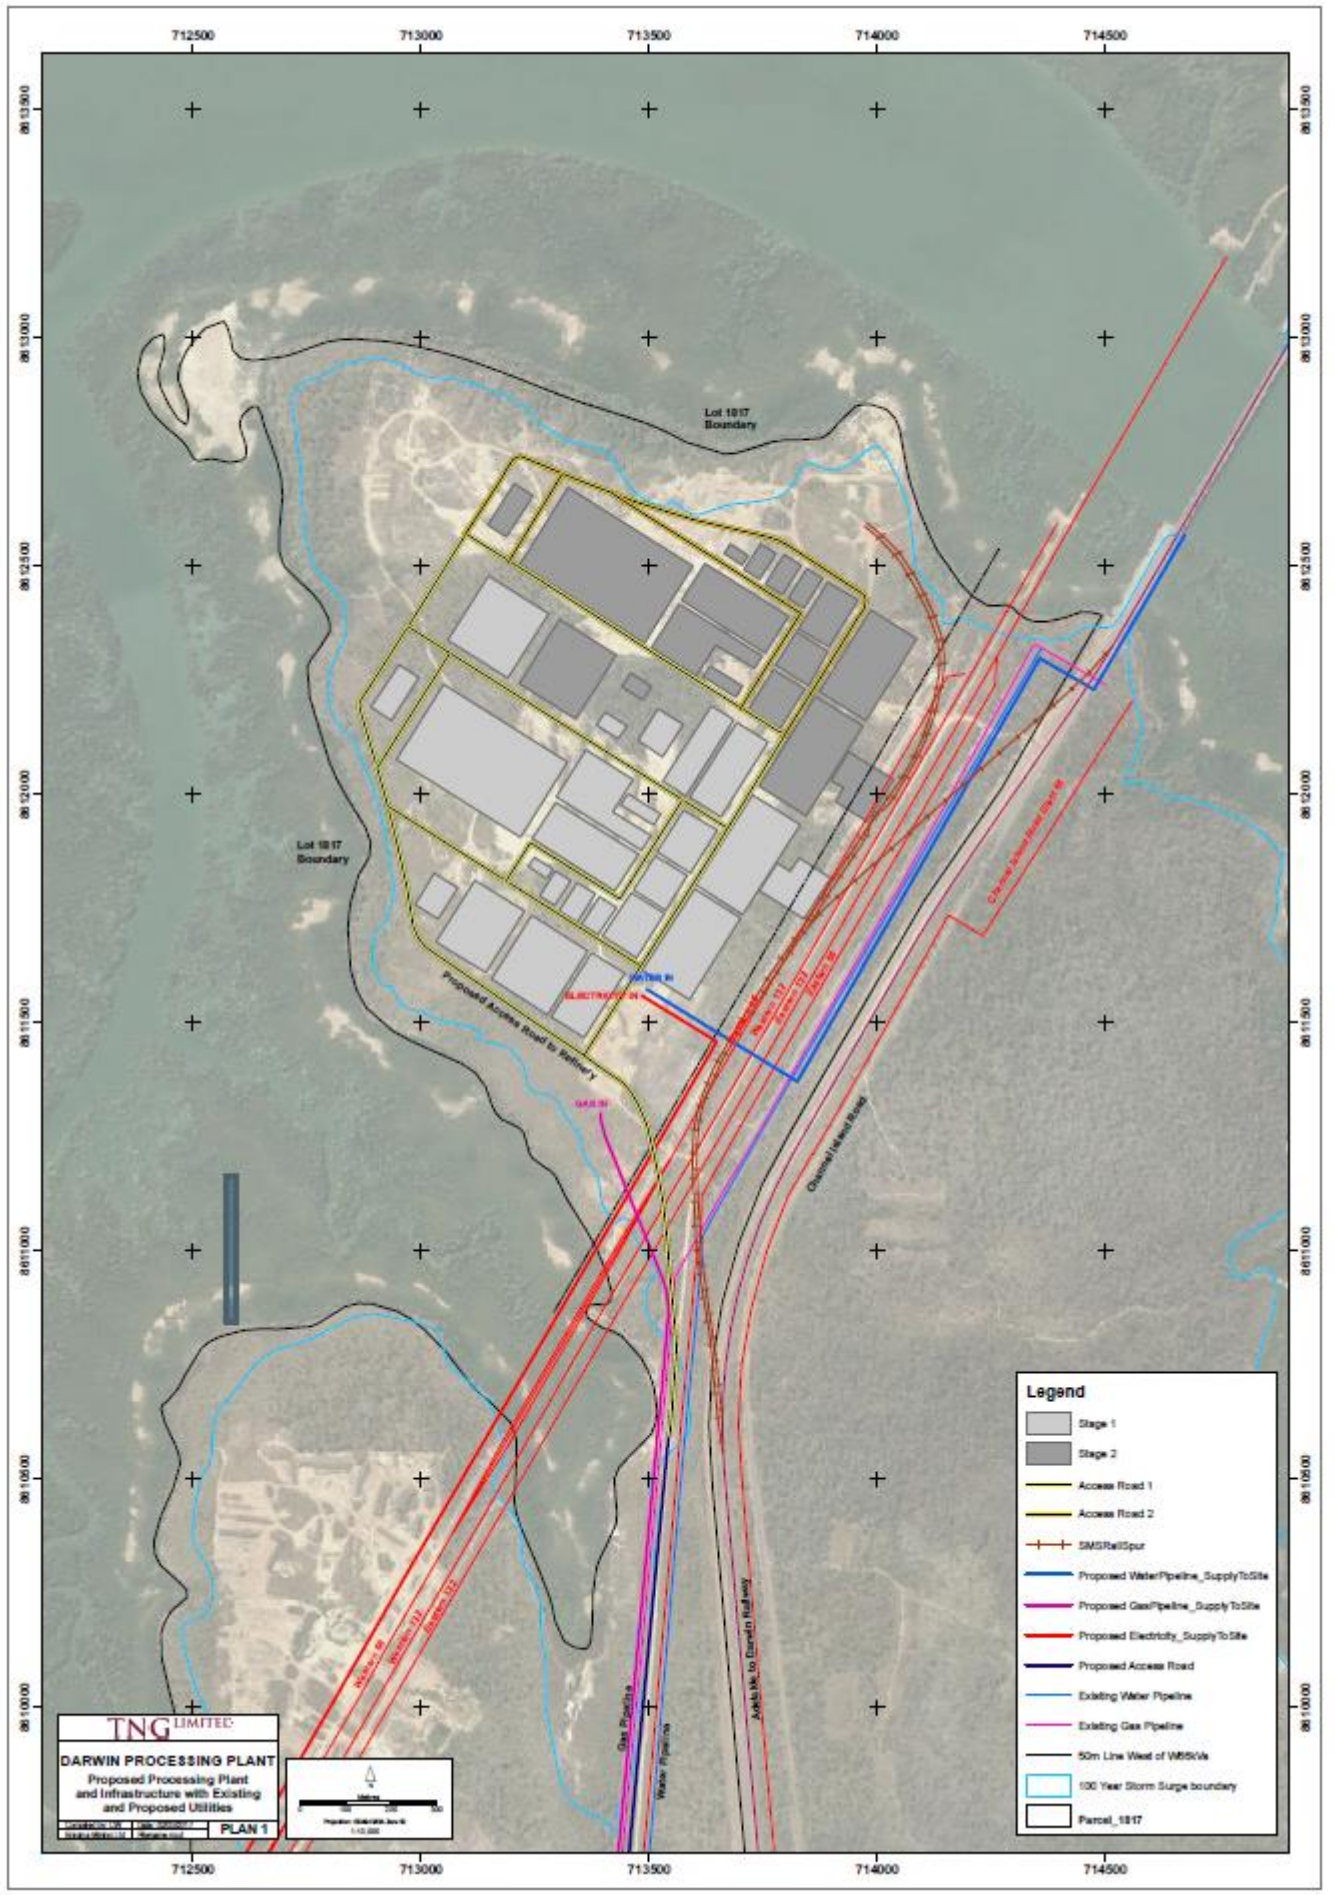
Detailed layout of proposed processing facility and associated infrastructure.
